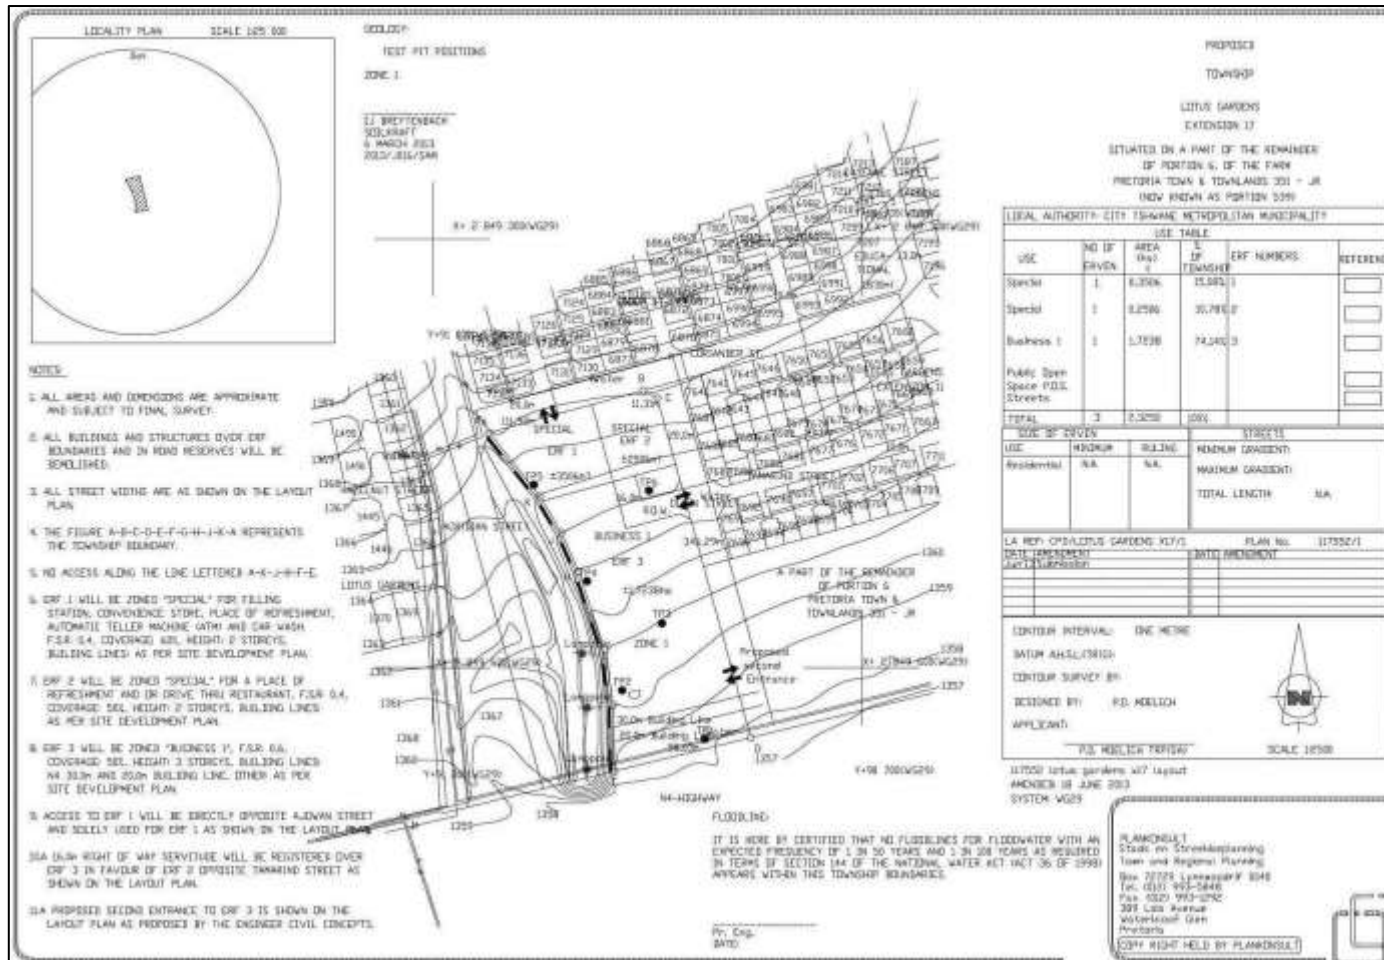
General site plan for the proposed Lotus Gardens X17 Retail Centre Development.
